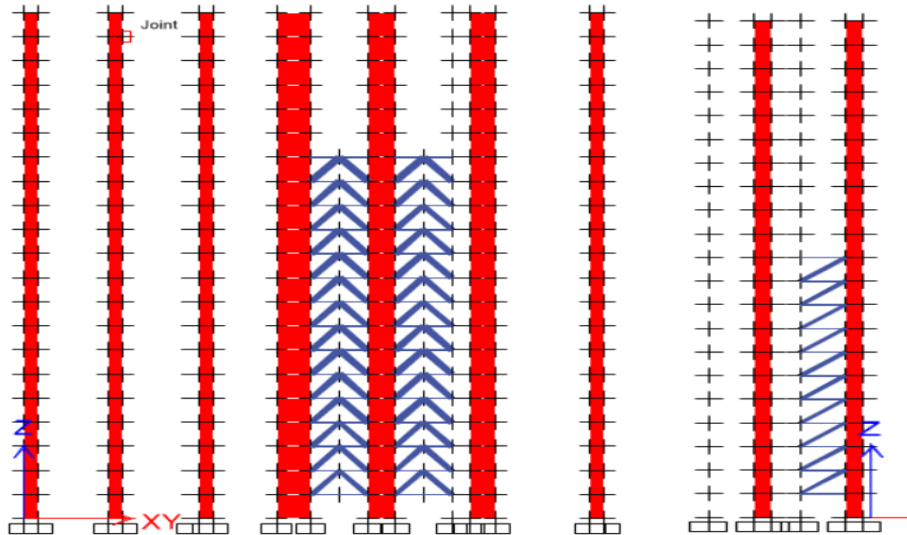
Elevation of steel braces X-1 and Y-1 on ETABS 2021
